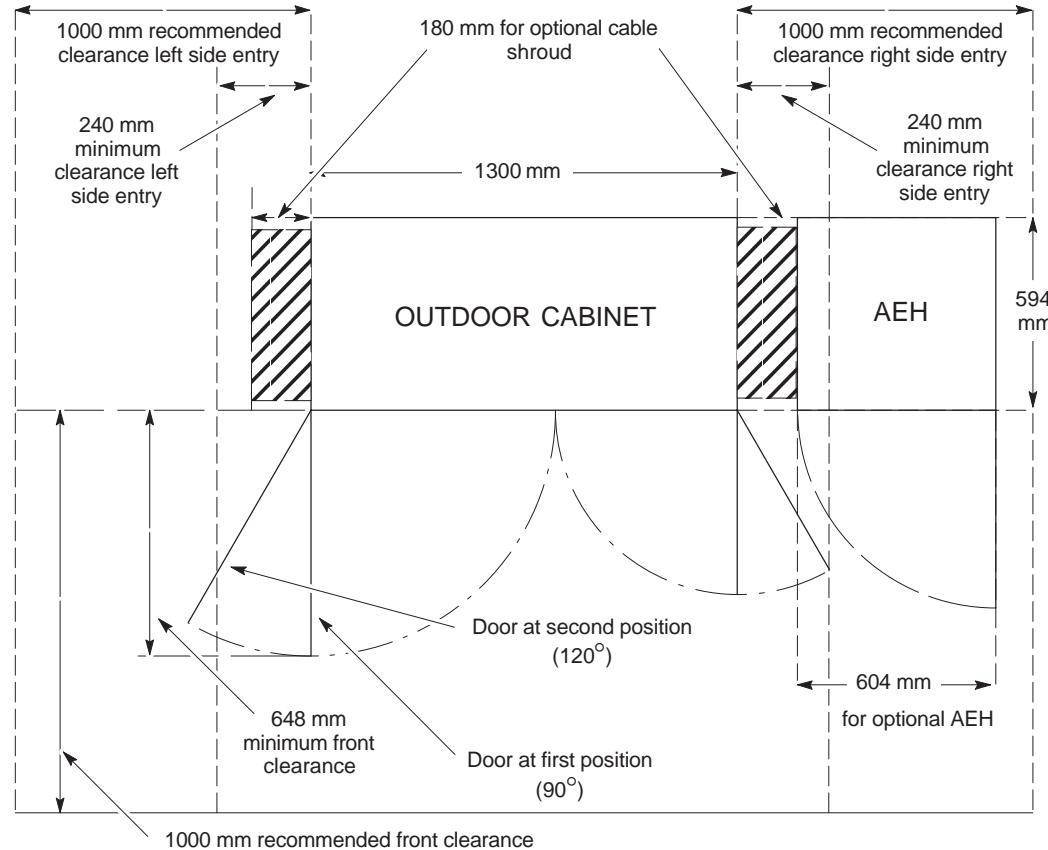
Outdoor cabinet site layout plan view (including optional equipment)
